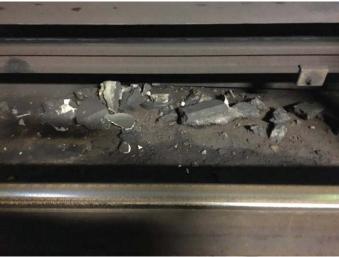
TRK 1 CM 25+50 – CONCRETE DEBRIS FALLING FROM THE CEILING OF THE TUNNEL CLOSE TO THE 3RD RAIL
